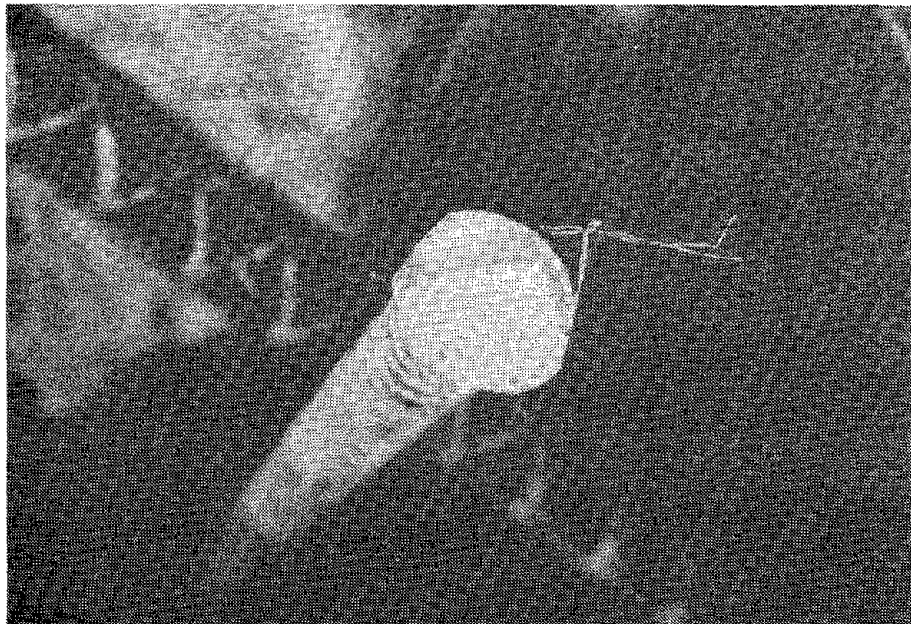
Close-up of gas pressure weld splice failure
